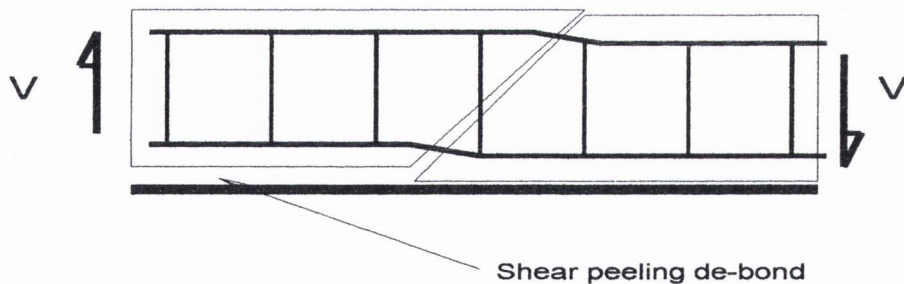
The mechanism of shear peeling of steel plates bonded to RC beams for flexural strengthening.
